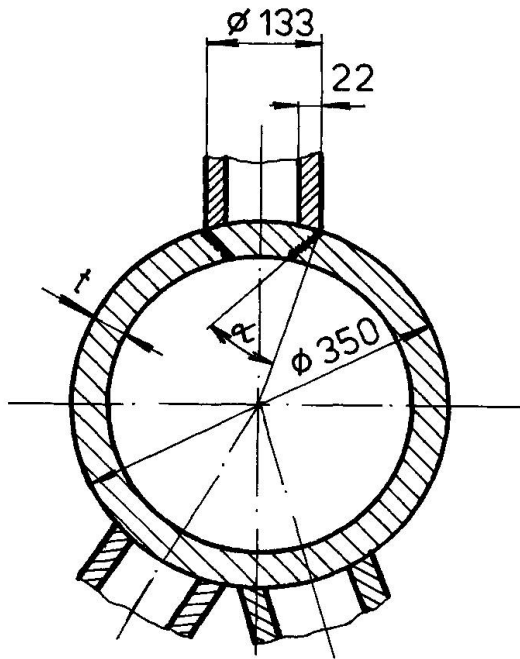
Sectional view of the spherical joint with conical crack
